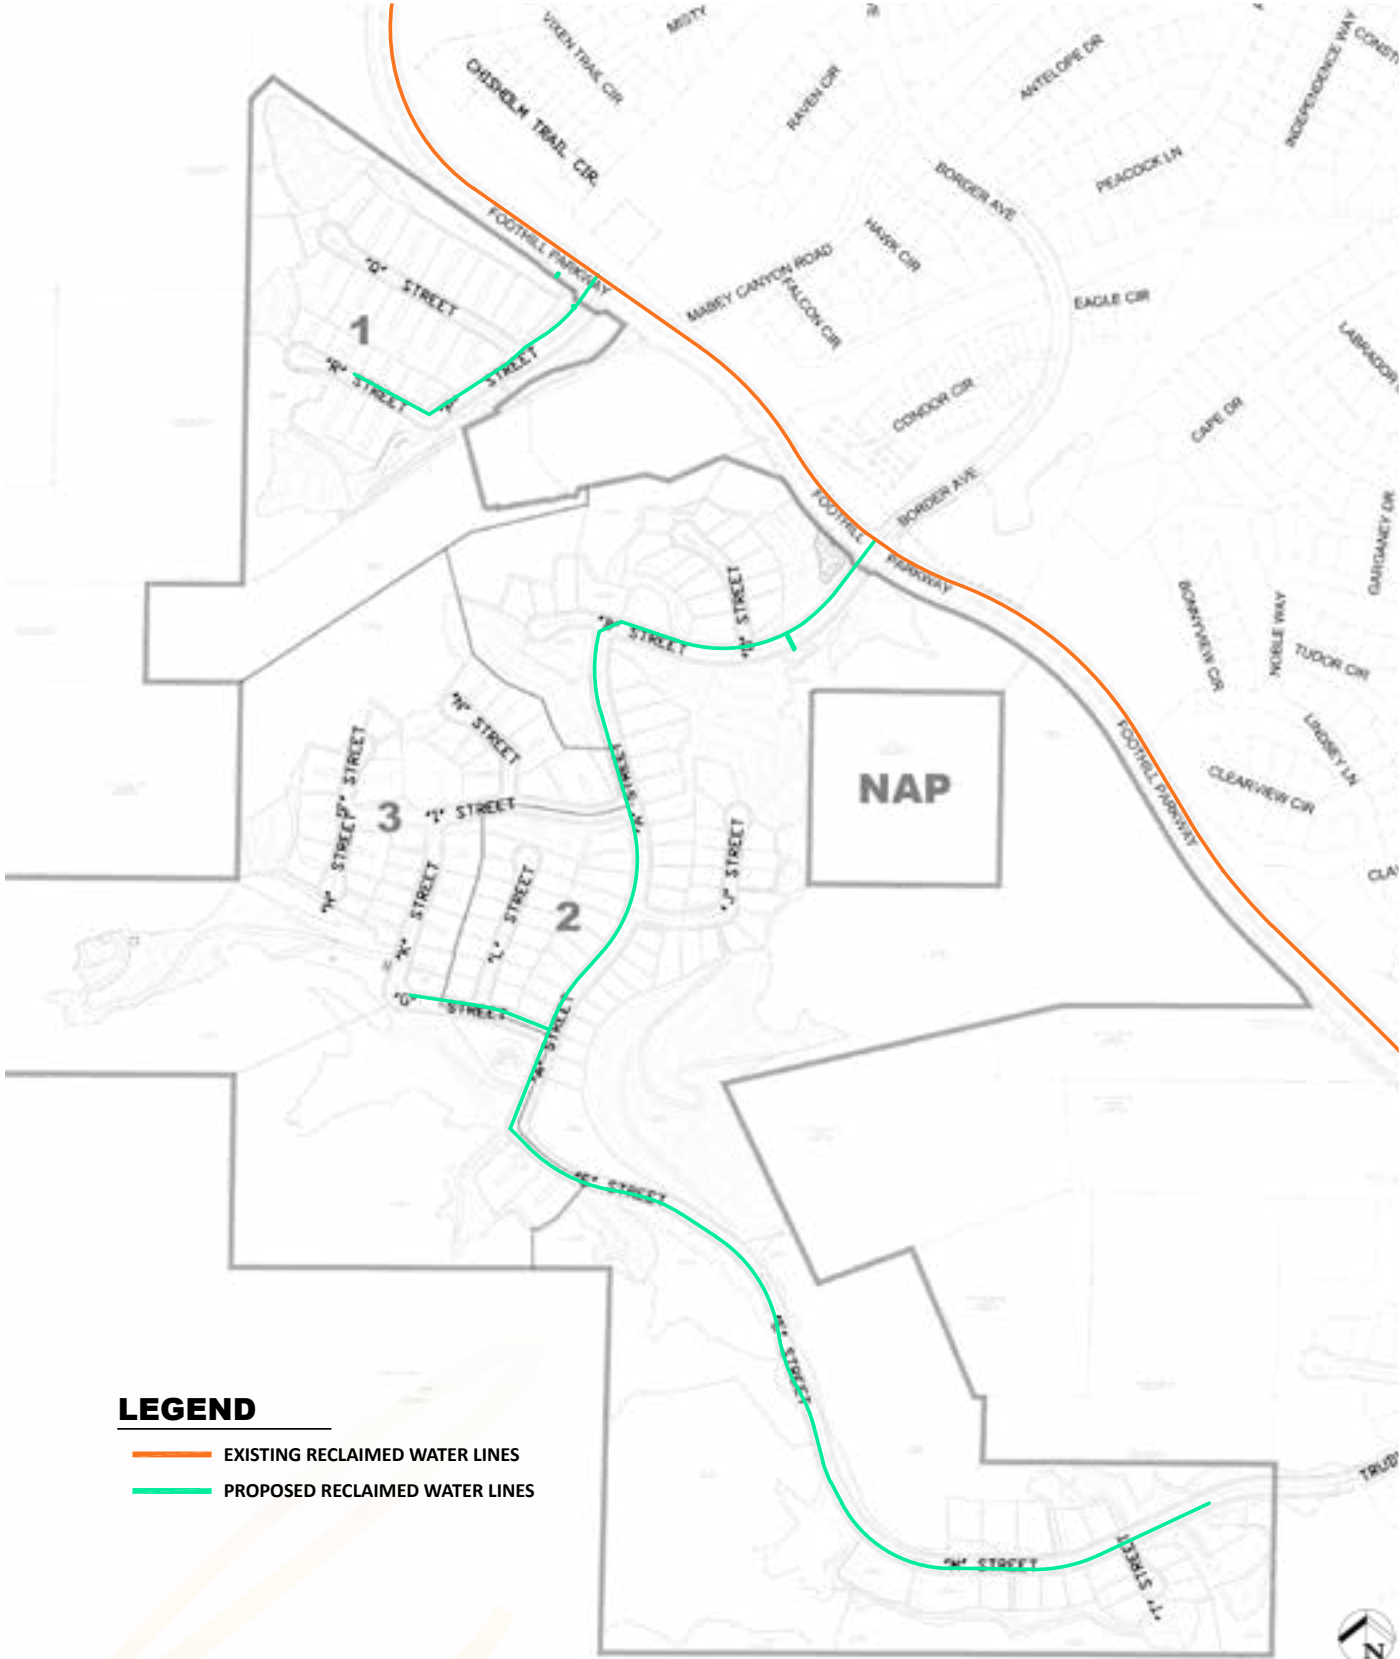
CONCEPTUAL RECLAIMED WATER PLAN
